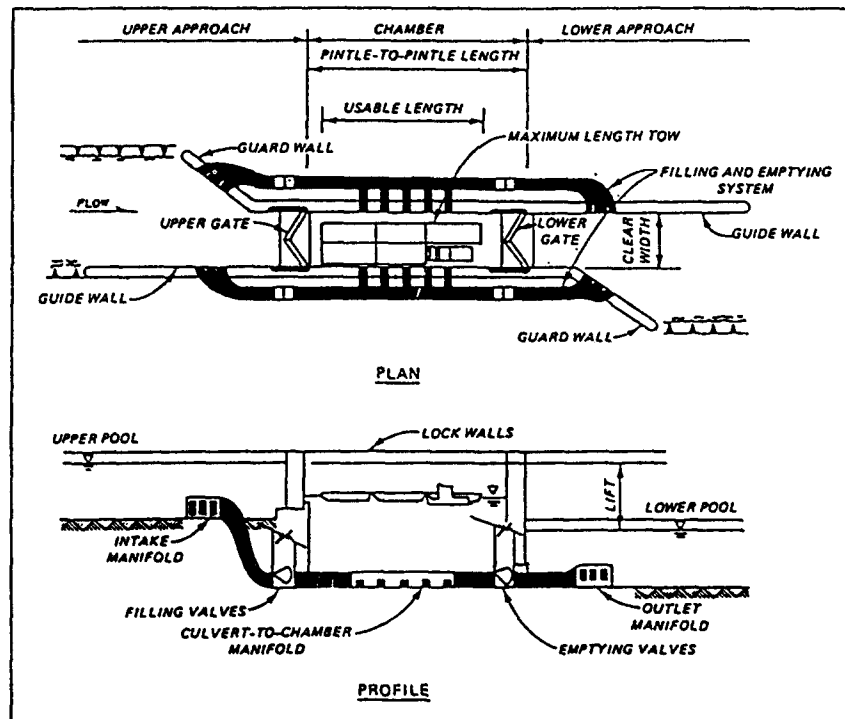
Common lock Features for a Lock with Culvert in the Sidewall
